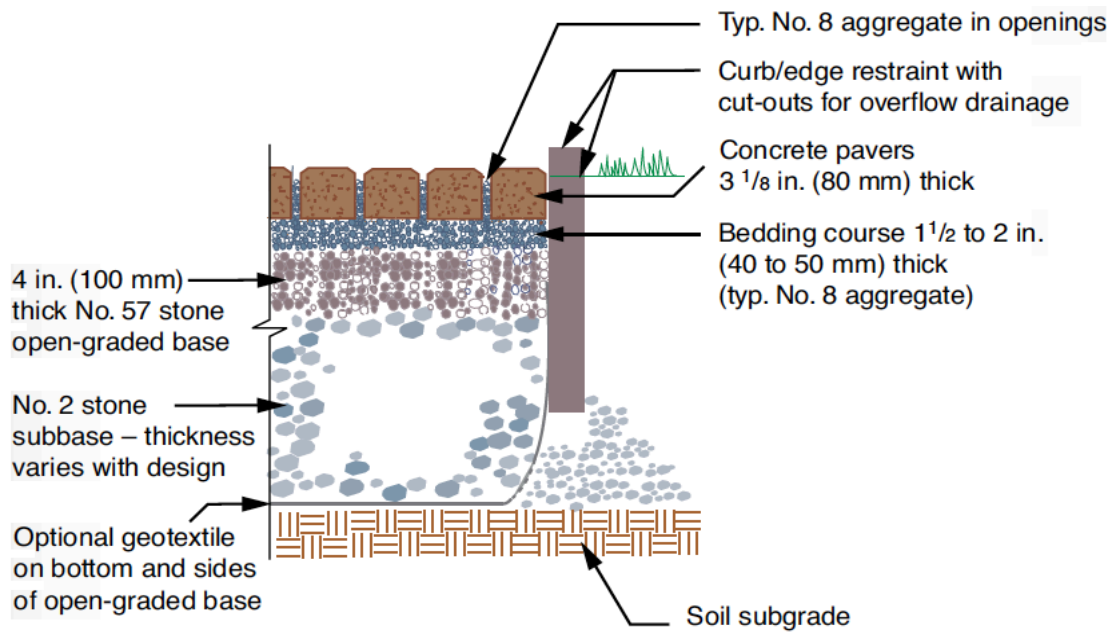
Typical Permeable Paver Section, *image courtesy of the Interlocking Concrete Pavement Institute
